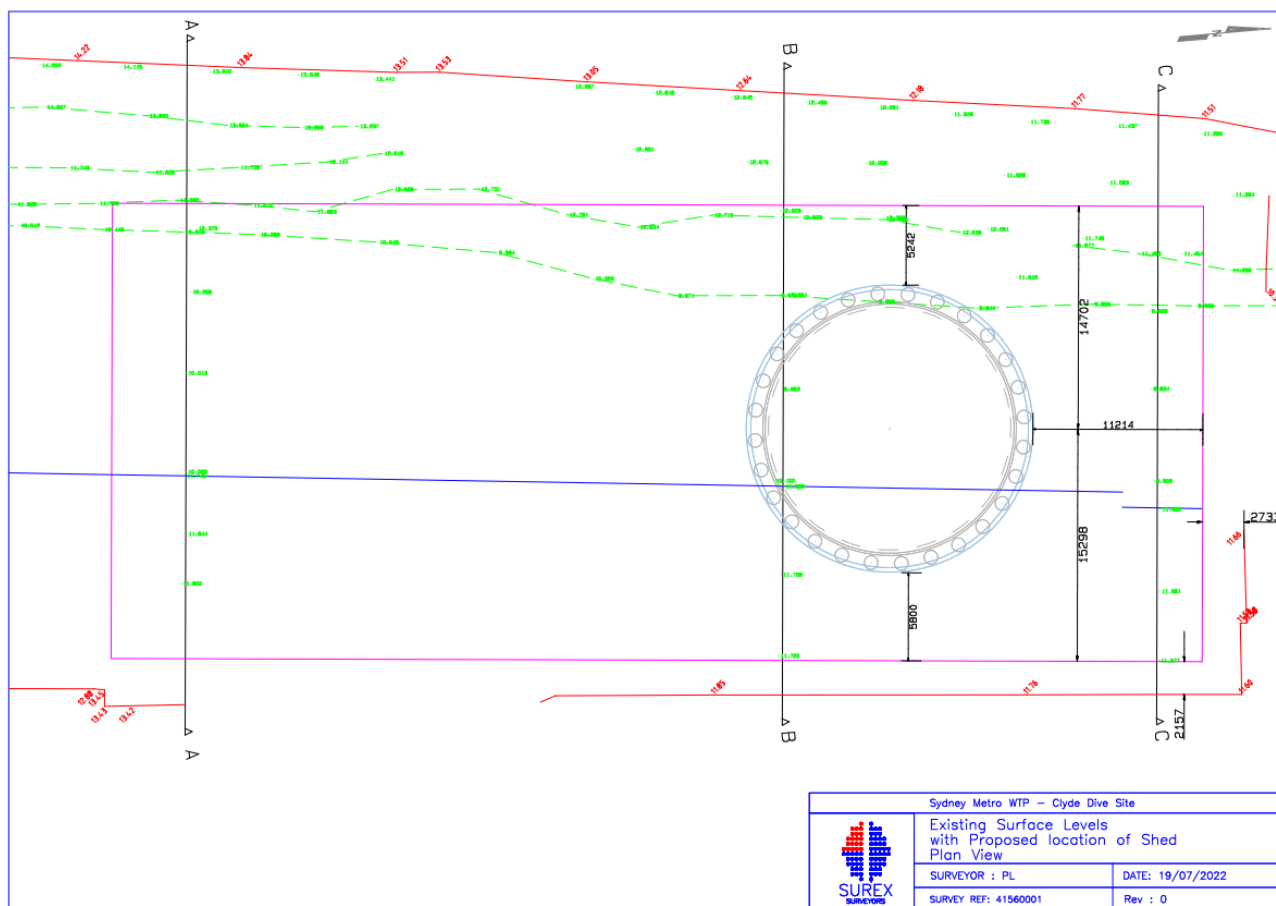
Existing Surface Levels at Proposed Location of Acoustic Shed – Plan View
